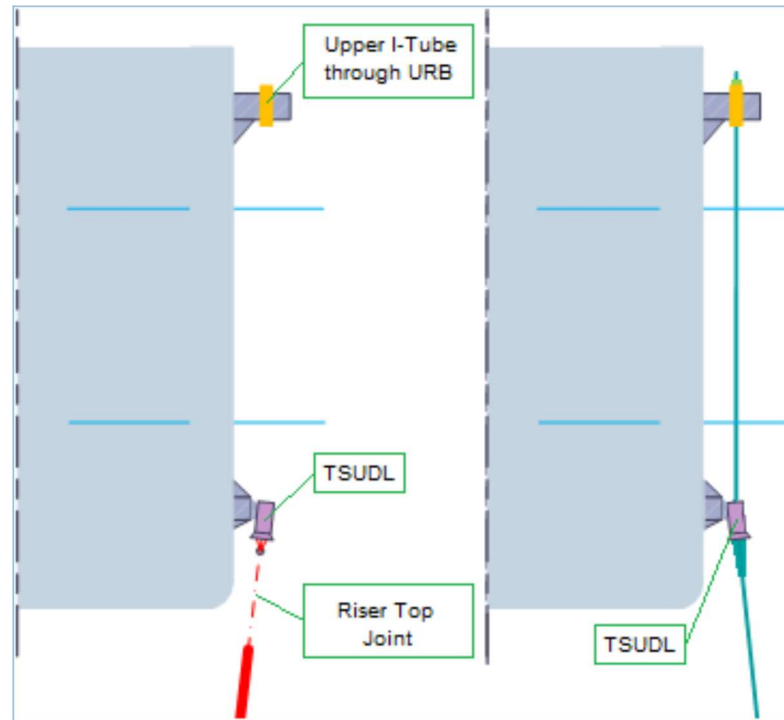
Riser Support Tube Assembly (TSUDL & Upper I-Tube) (Illustrative)
